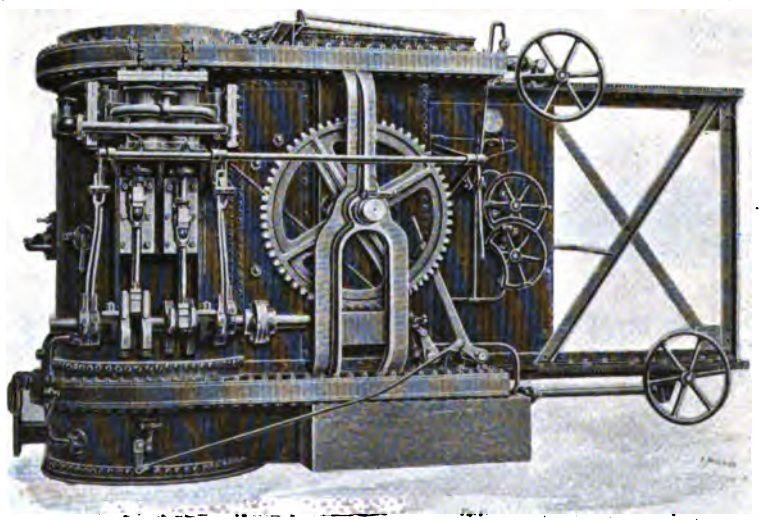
MATERIAL LOCK, FORTH BRIDGE.
